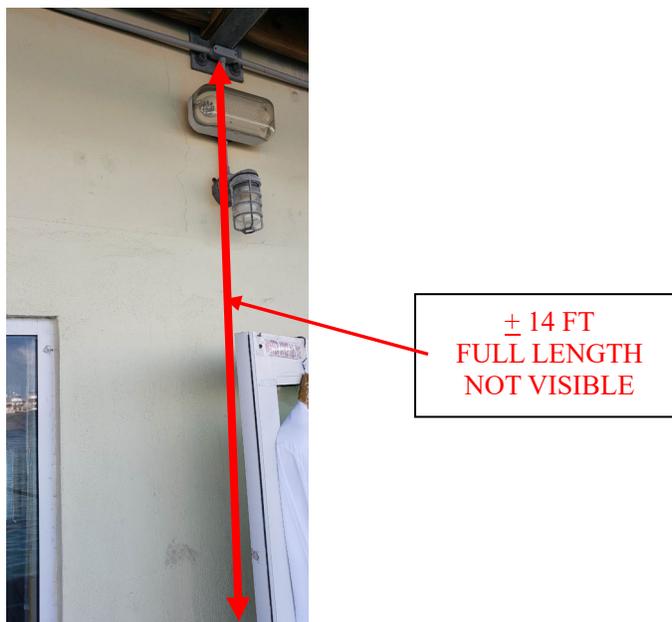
Location 30. Approximately 14 ft long new 16x12 concrete column.
